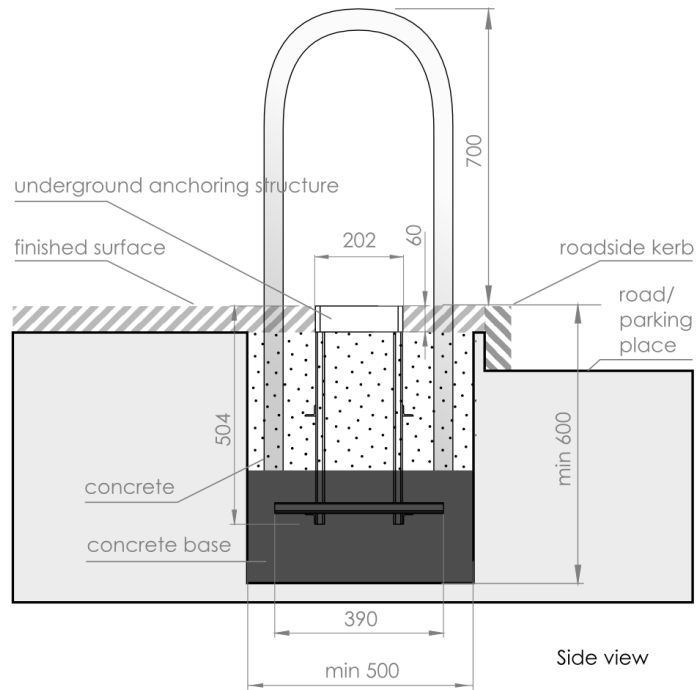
Transversal section of the excavation and safety arches on the kerb with two safety arches
